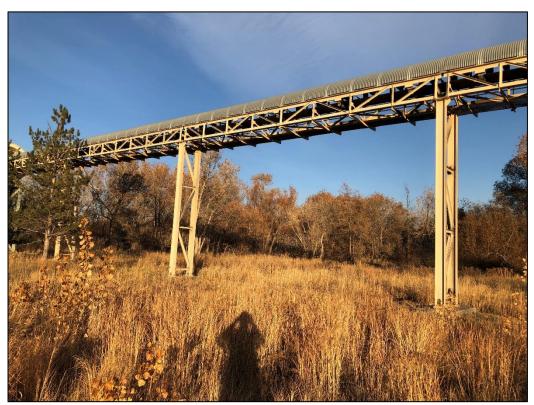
View looking northeast across portion of above ground conveyor system just south of St Vrain Creek. This area appears to be within the approved permit boundary.
